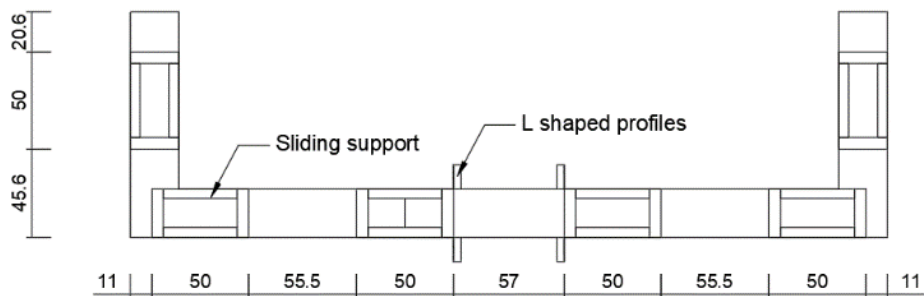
Out of plane bending of "C" walls tests setup and positions of sliding supports, plan view.
